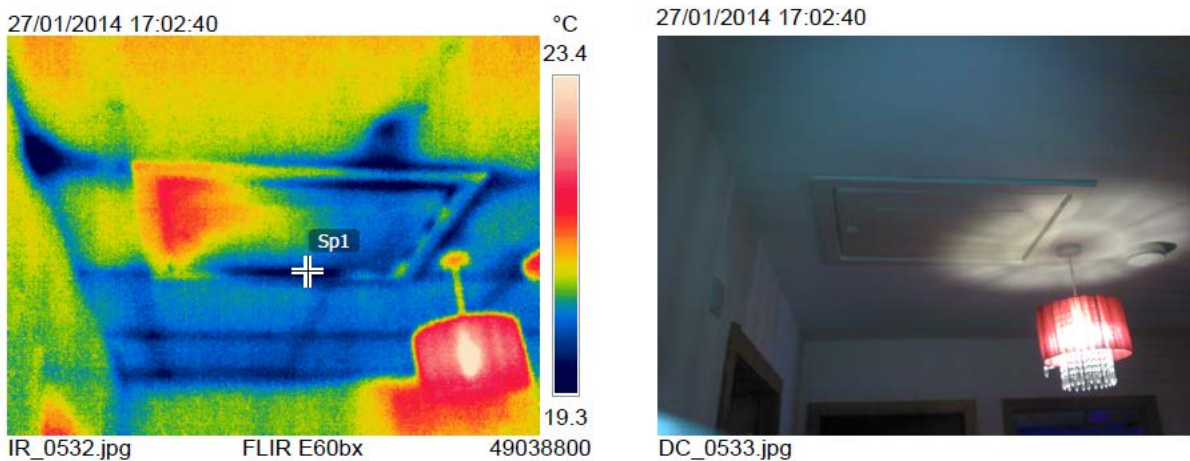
8: Thermal image of wall under test, highlighting location of non-repeating thermal bridge in first floor hall ceiling.
